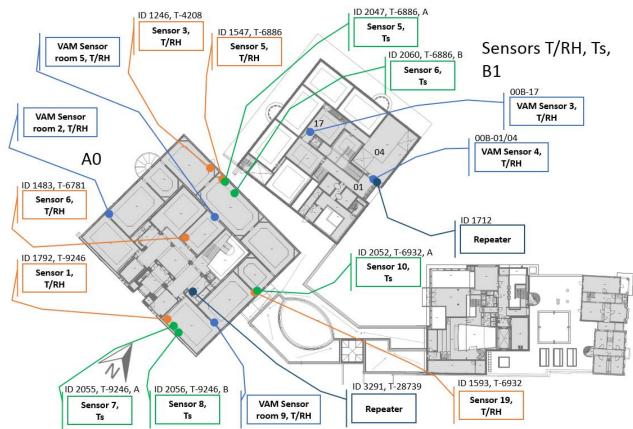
T/RH/T_s sensors, measurement locations A0 and B1, floor plan under layer by Cahen (2003).
